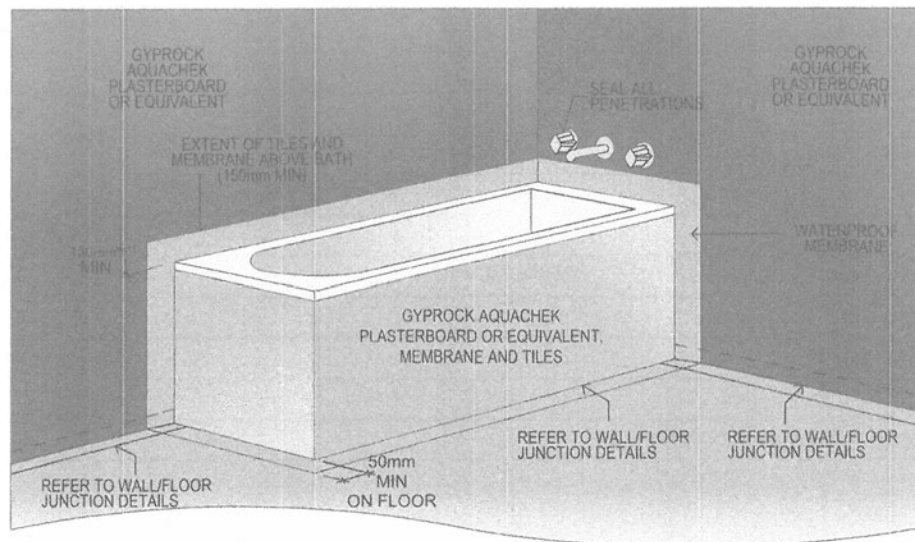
INSTALLATION LAYOUT FOR A BATH WITHOUT SHOWER
